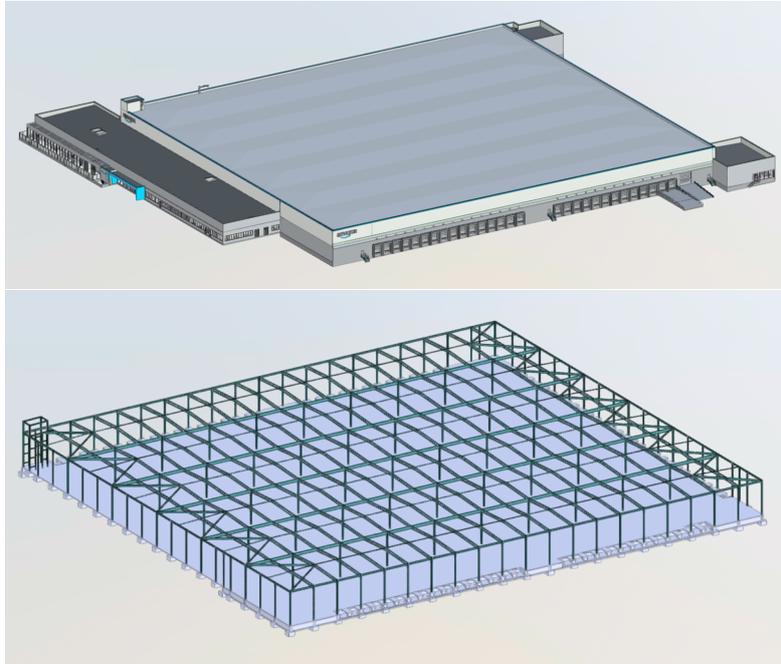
Steel (SC16) warehouse design overview (top), load-bearing frame, floor slab and foundation pads (bottom)
